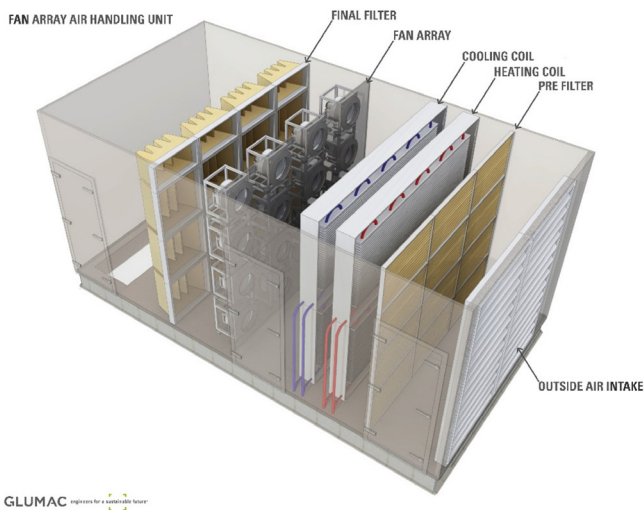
Air Handling Unit Fan Wall Arrangement Example.
